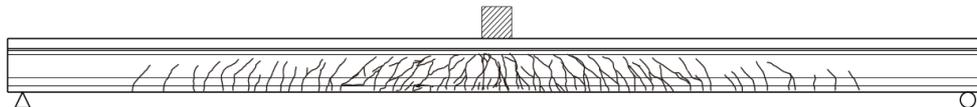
Crack pattern of Sansung-Woochun (when failure)
